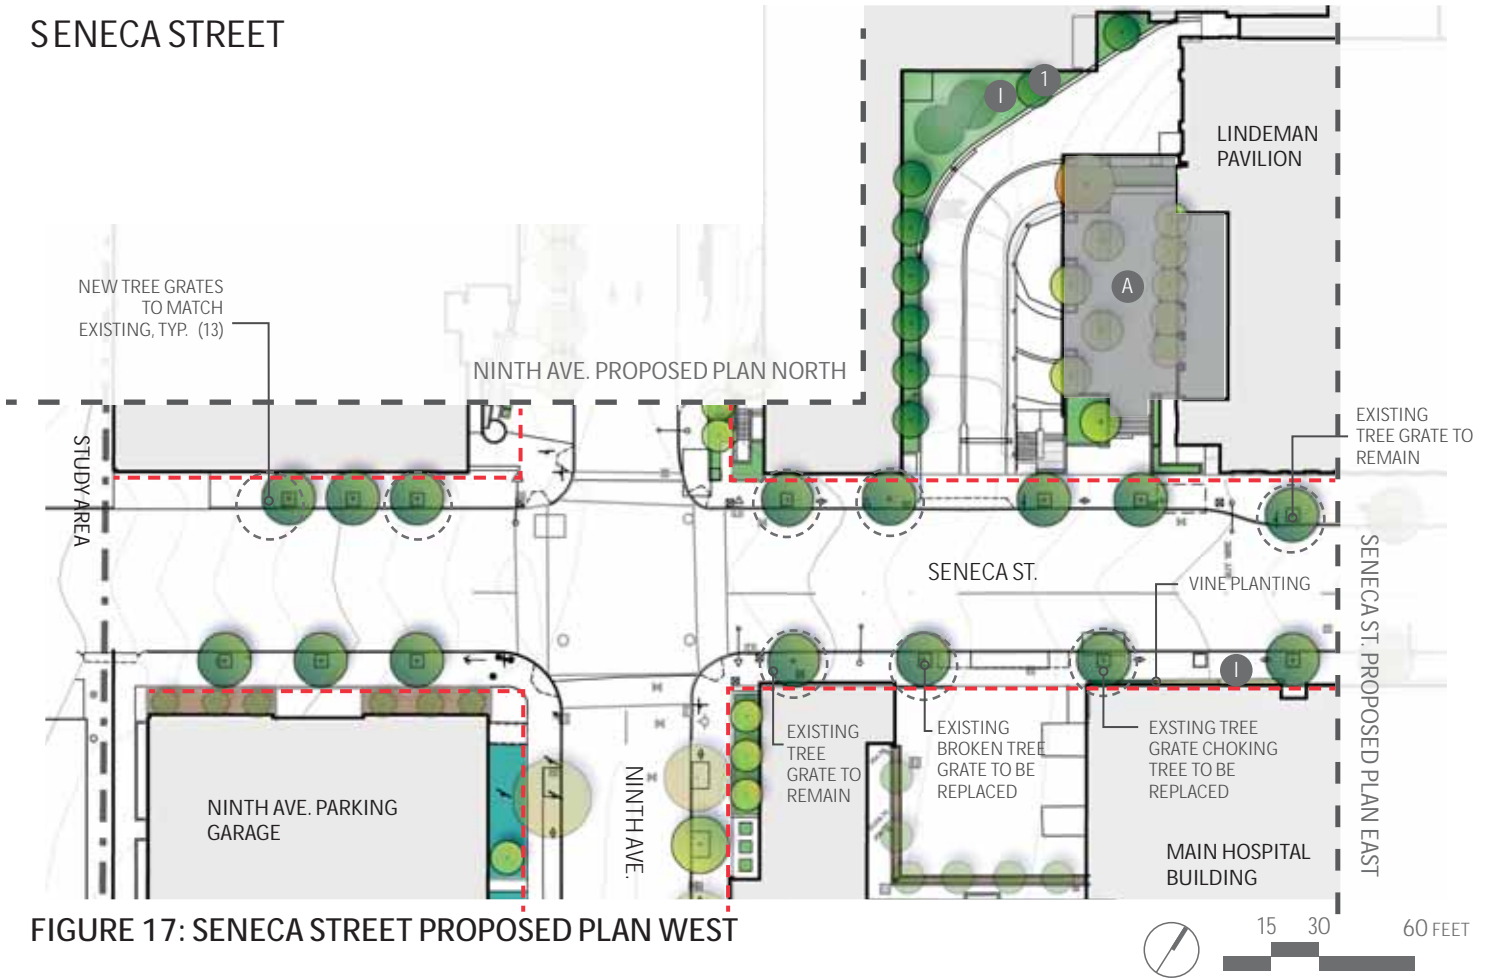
SENECA STREET PROPOSED PLAN WEST
